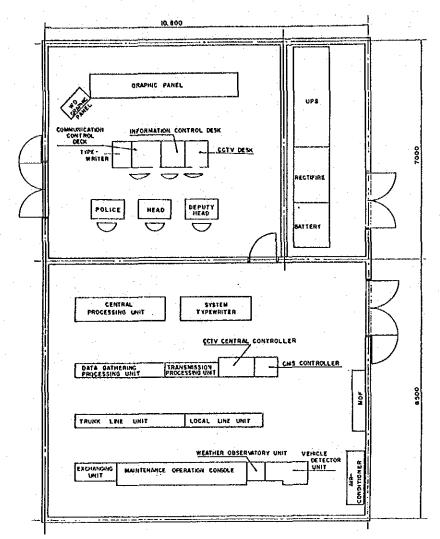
Control Center Layout Plan at MHA's Maintenance Office
